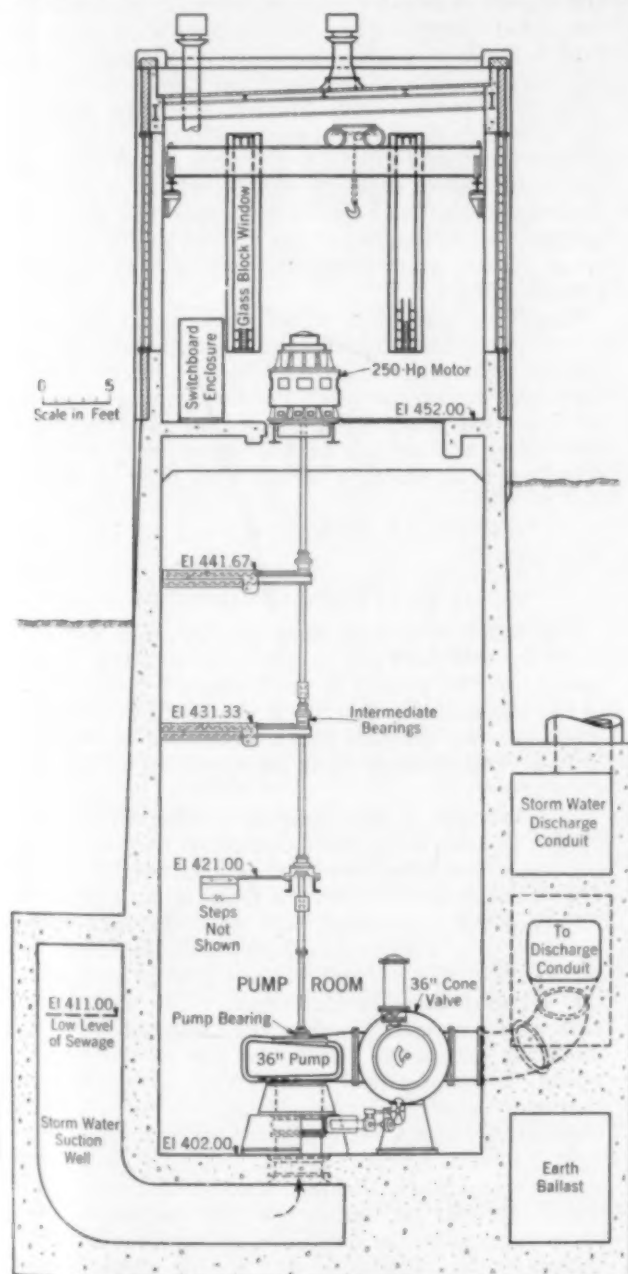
TYPICAL CROSS SECTION OF SEWAGE PUMPING STATION
